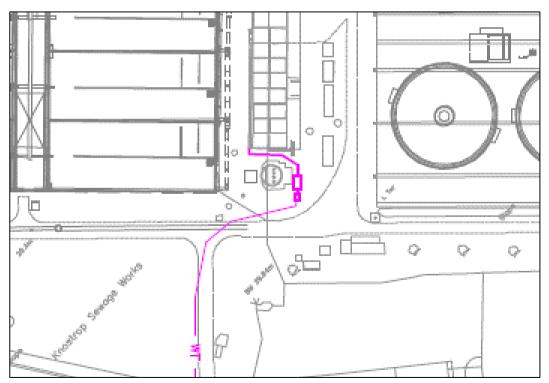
Indicative layout of the pipework and kiosks for Option 2 (shown in proportion to existing infrastructure)
